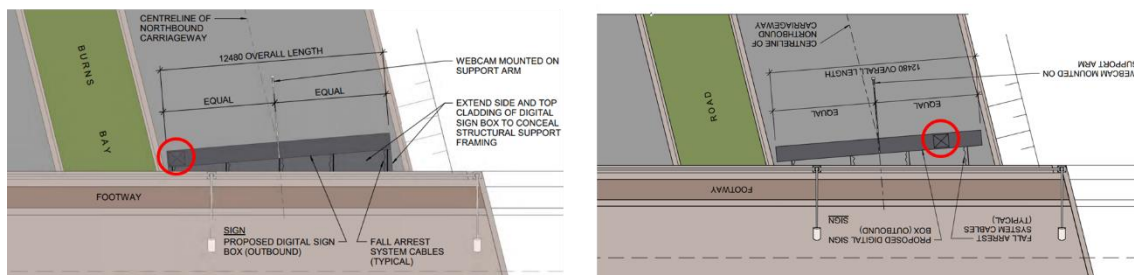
Access hatch location - approved plans (left) and proposed plans (right) (Source: Arcadis/DBCE & Keylan markup)
